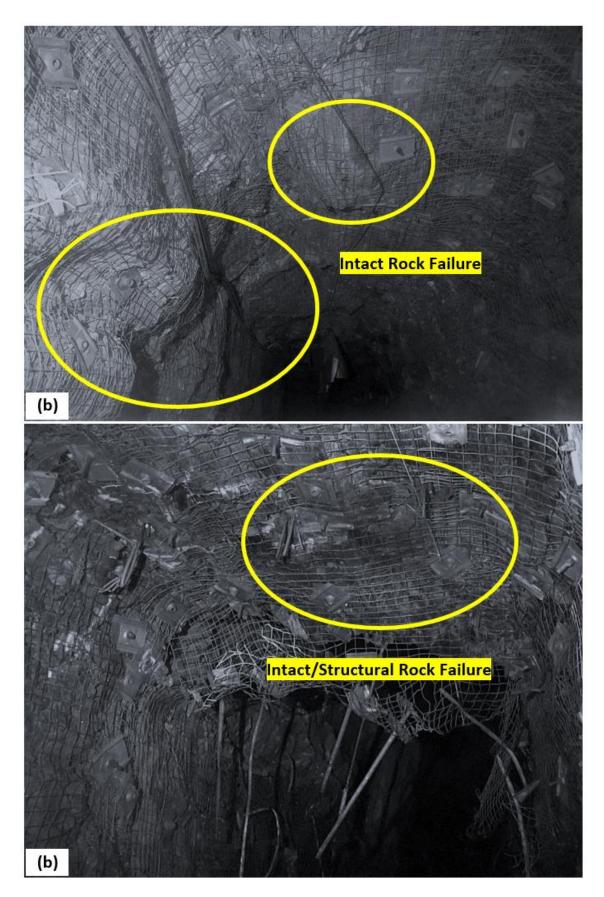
Ground behaviour modes in ore drive (a) intact rock failure, (b) intact/structural failure
